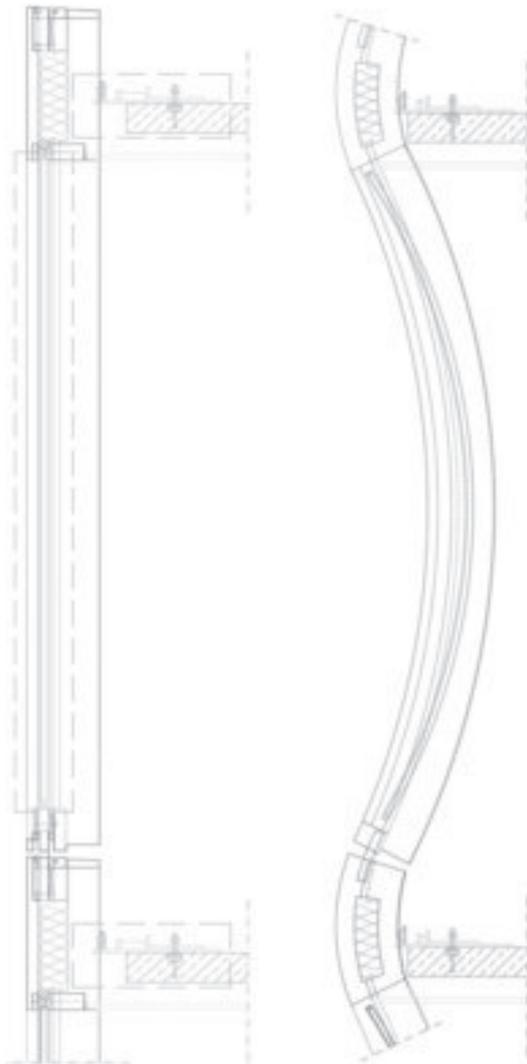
Typical facade section. Left: Unloaded. Right: Deformed under bomb blast load
